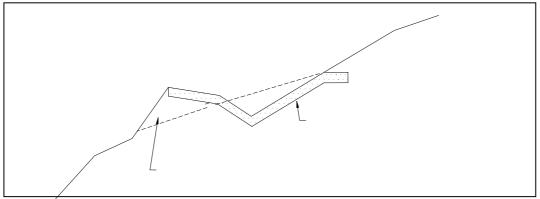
Drainage Ditch with Soil-Cement Mixture
